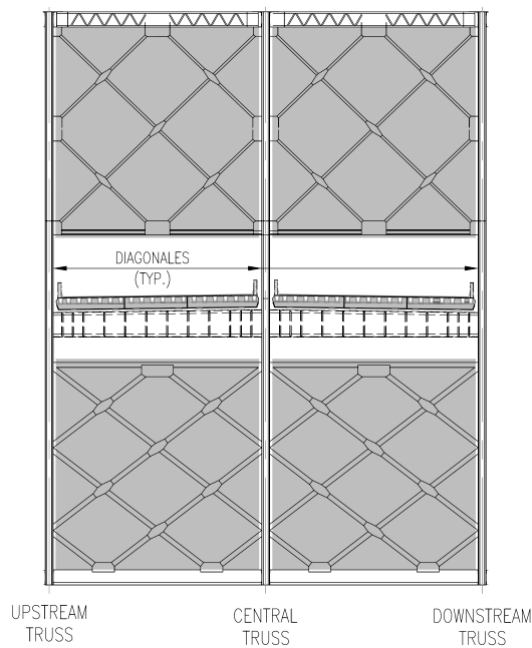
Cross-section of spans 2W to 2E – Section 6 (Source: JCCBI nomenclature drawings)
